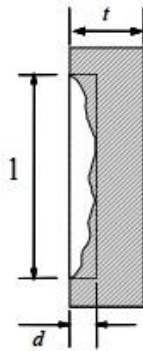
Geometric dimension of a circumferential corrosion defect [44]
